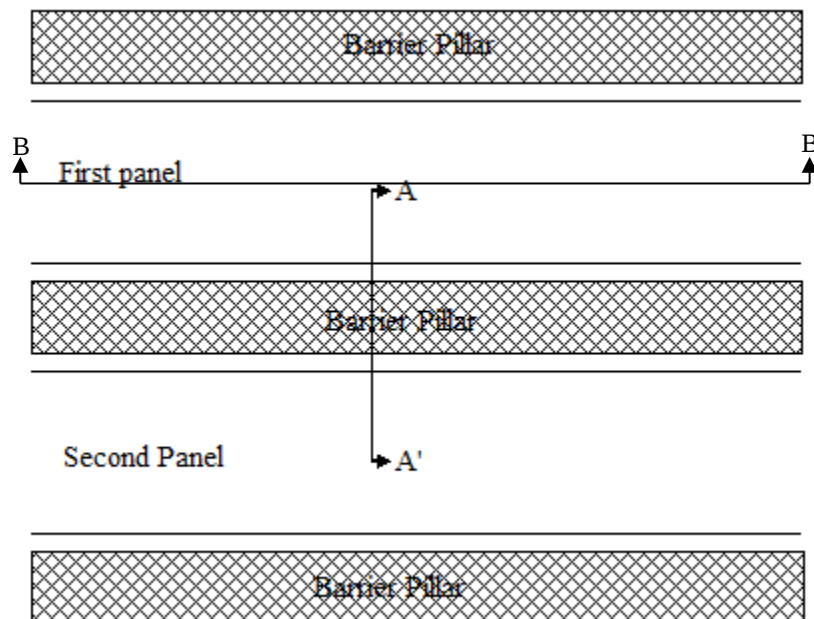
Schematic diagram showing proposed Longwall panels (Plan view)
